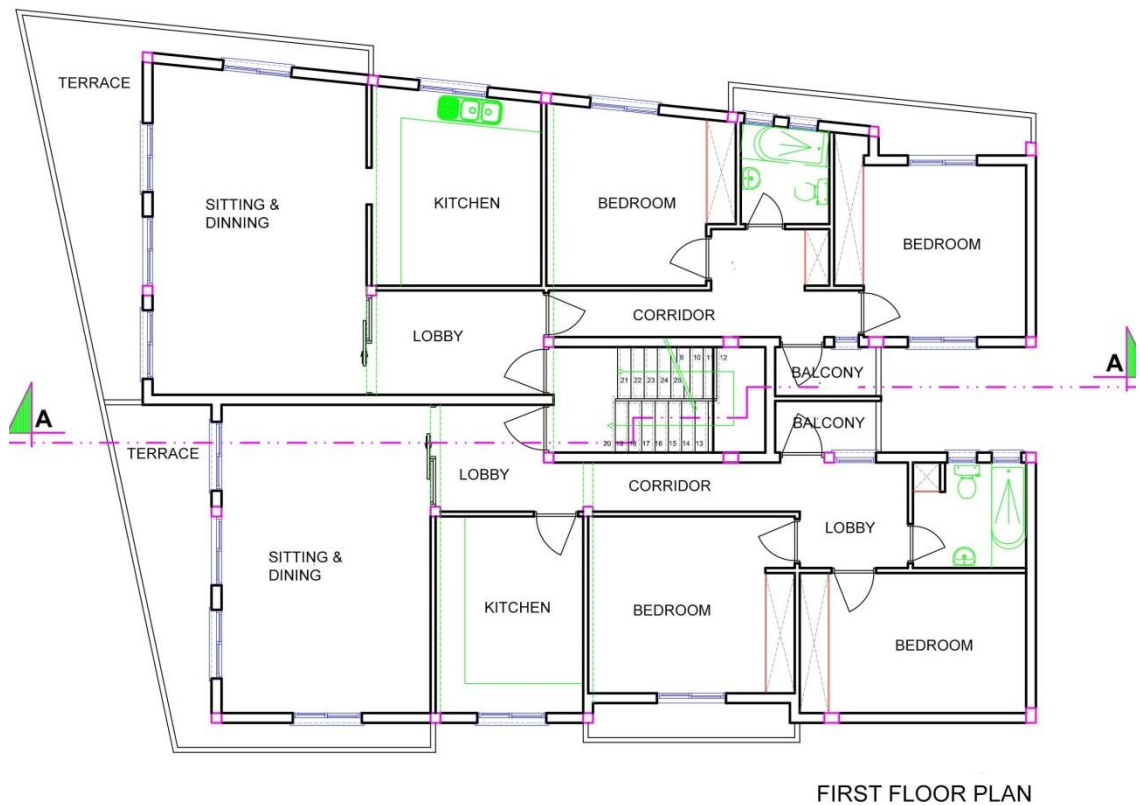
First Floor plan of Efecan Building Complex; (Owner, 1973)
